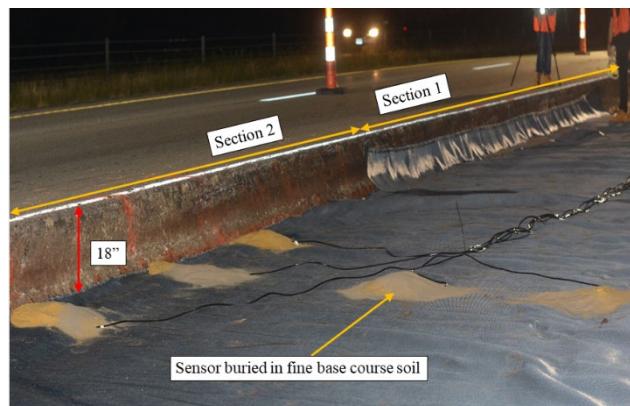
Sections 1 and 2 during construction, placement of wicking geotextile and instrumentation.
